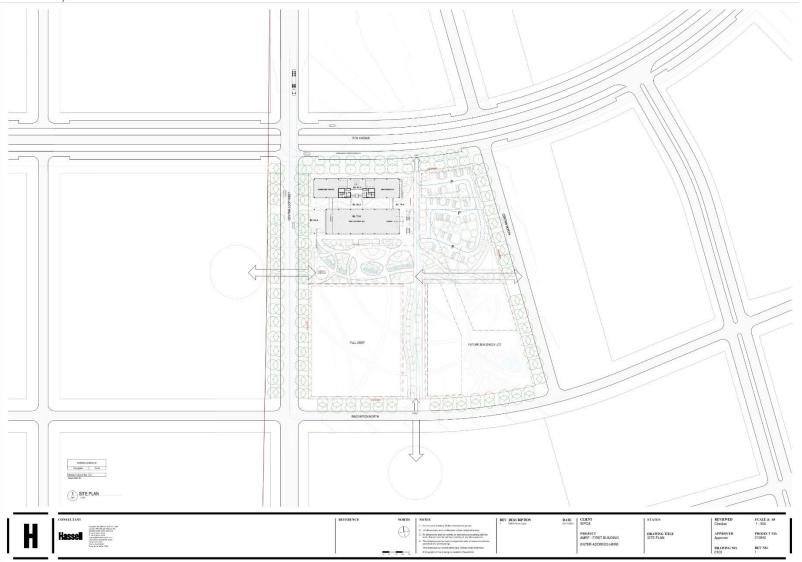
AMRF – First Building site plan (Architectural drawings prepared by Hassell, 2021).
